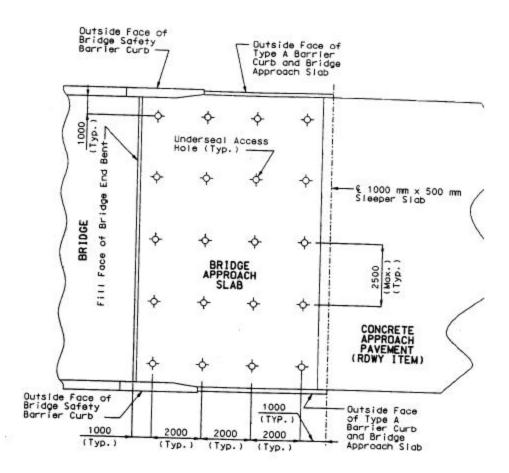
MoDOT Standard Approach Slab Design Plan View.
